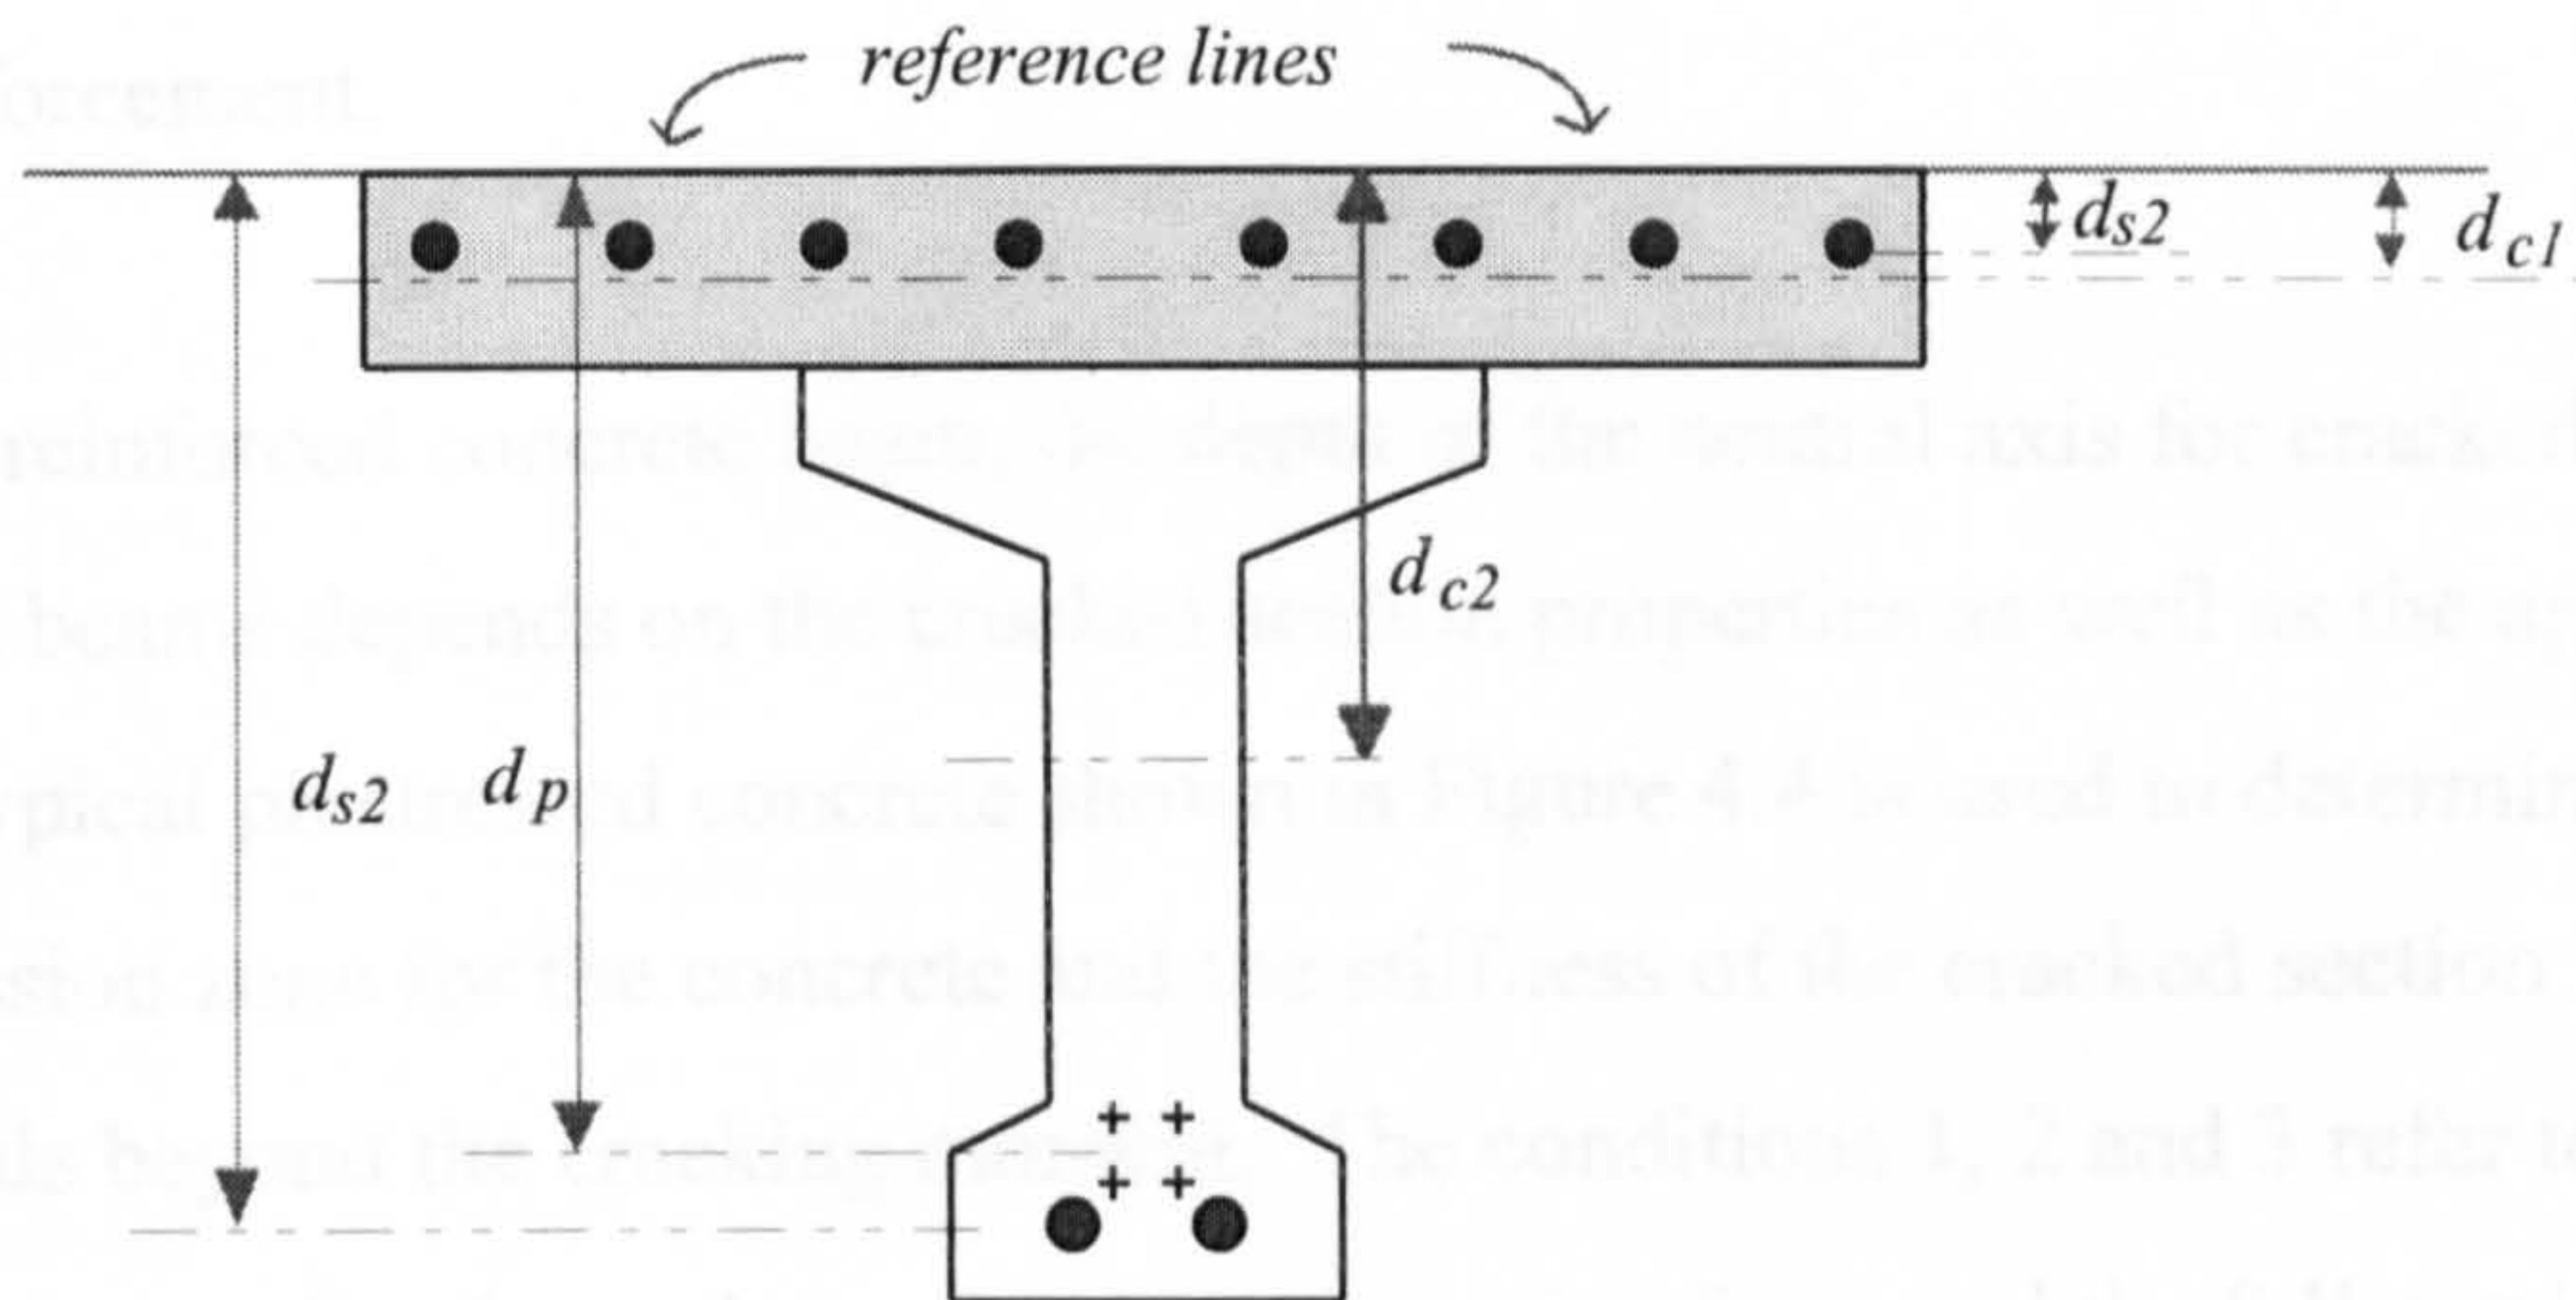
A typical composite section of precast prestressed beam and cast insitu slab
